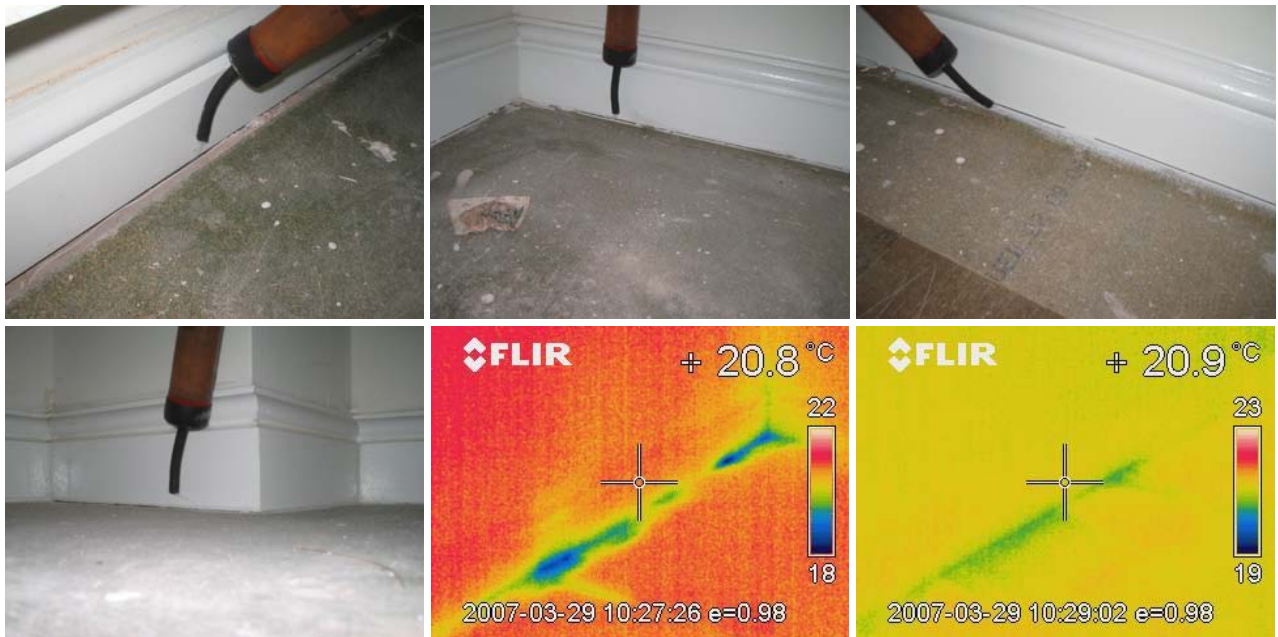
Failure of the flexible sealant on 1<sup>st</sup> floor wall junctions, with cooler air entering the dwelling on external walls than on internal walls under dwelling depressurisation.
